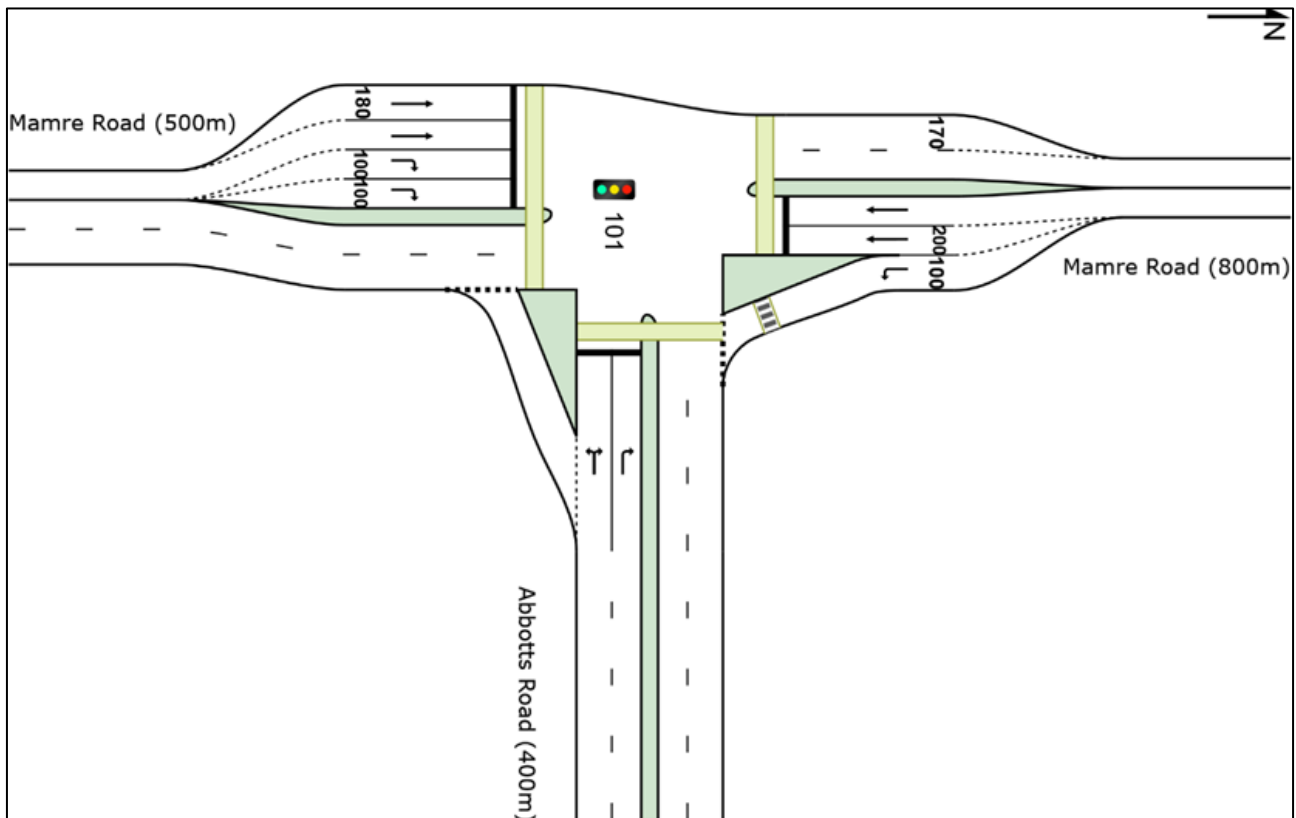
Interim 2026 SIDRA Intersection Layout – Mamre Road / Abbotts Road
